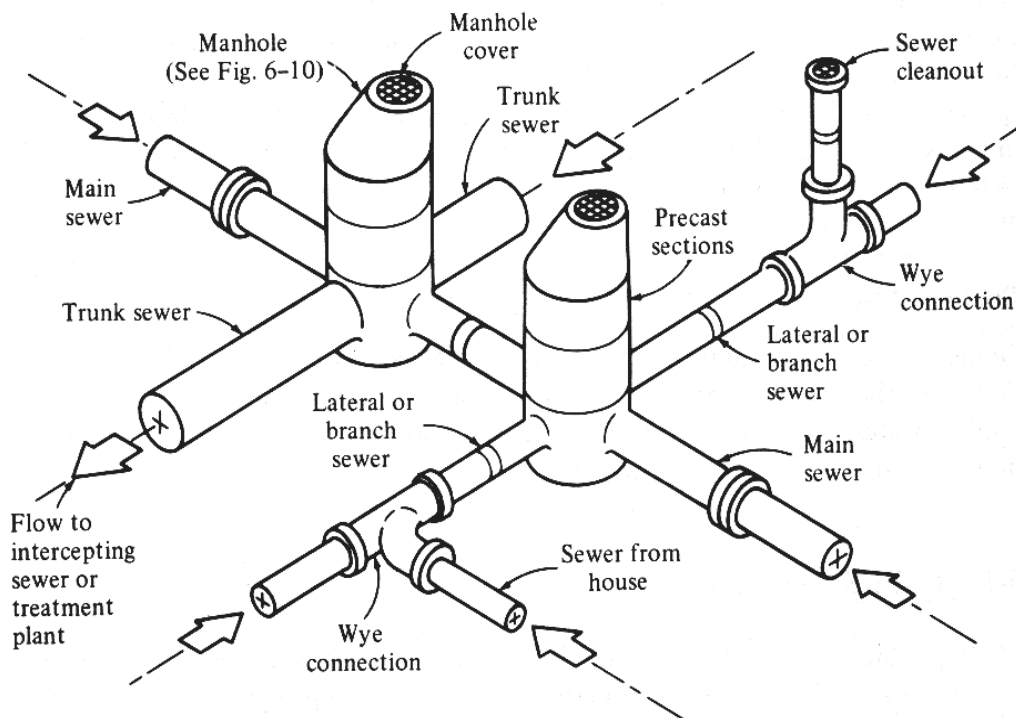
Definition sketch for types of sewers used in collection systems.
